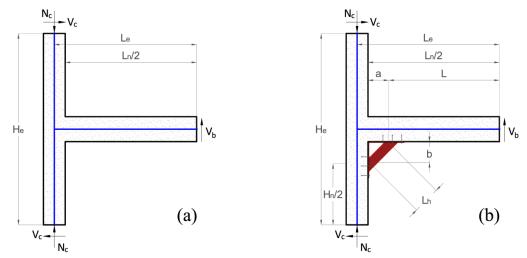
External actions on exterior beam-column joint: (a) Non-Retrofitted System (NRS); and (b) Single Haunch Retrofitting System (SHRS).
